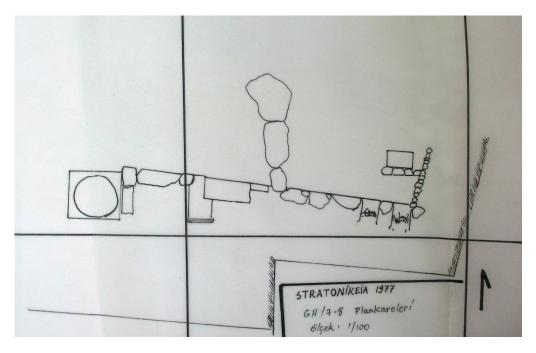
Plan layout of Byzantine city wall (Archeological excavation reports)
